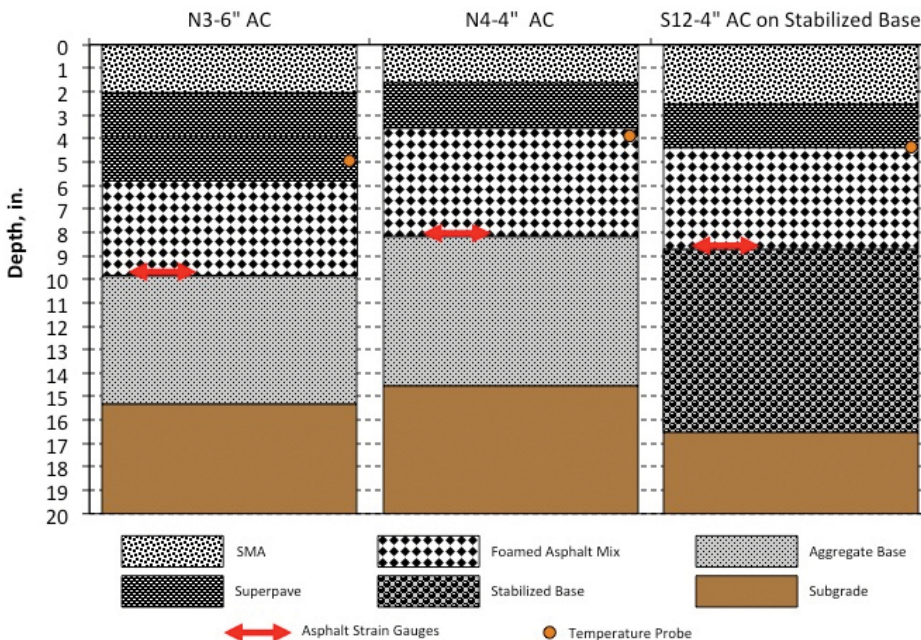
Cross-section of VDOT sections at 2012 NCAT Pavement Test Track
